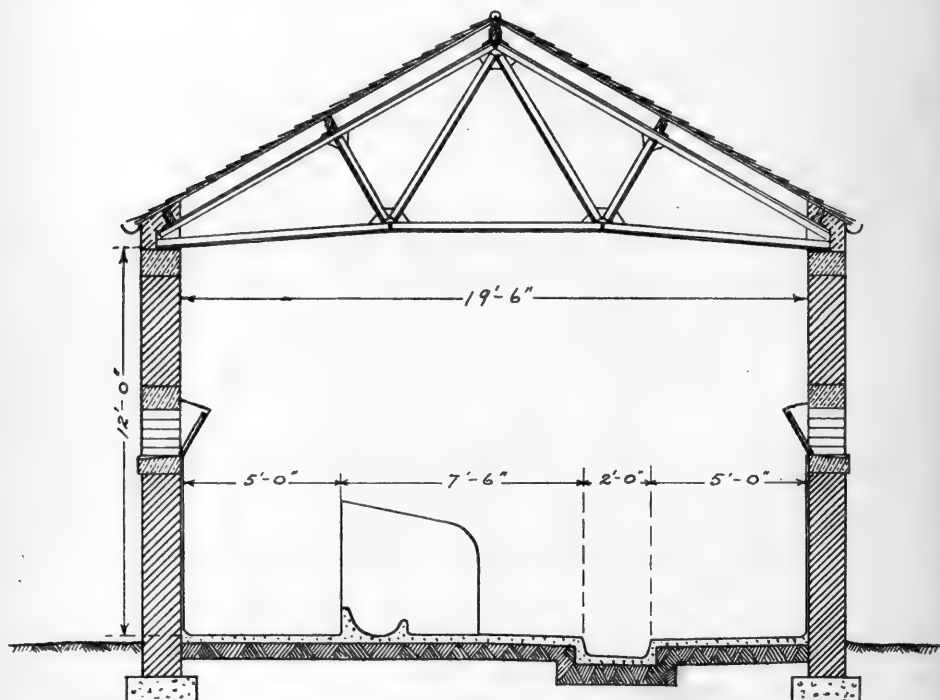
Section of a single byre with a feeding passage, Sherringham windows and steel roof trusses. Outlets for foul air may be by extraction cowls or louvred ventilators. The dimensions given are for large cows. The feeding passage may be one foot less and the milking passage one foot wider if desired.
